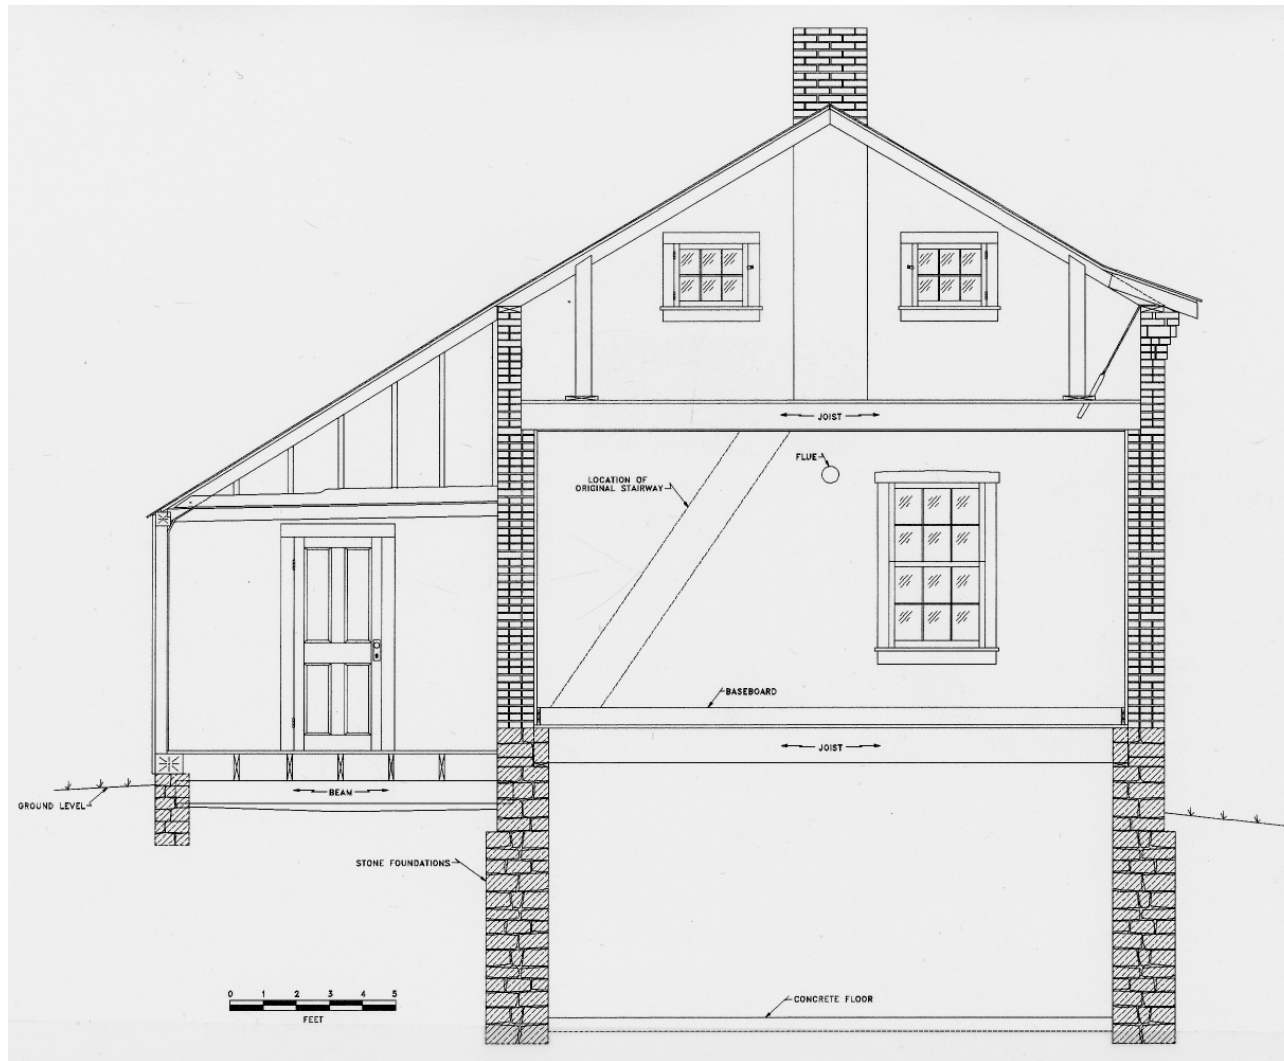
Sectional view of the Valentine House, showing west gable-end wall.
